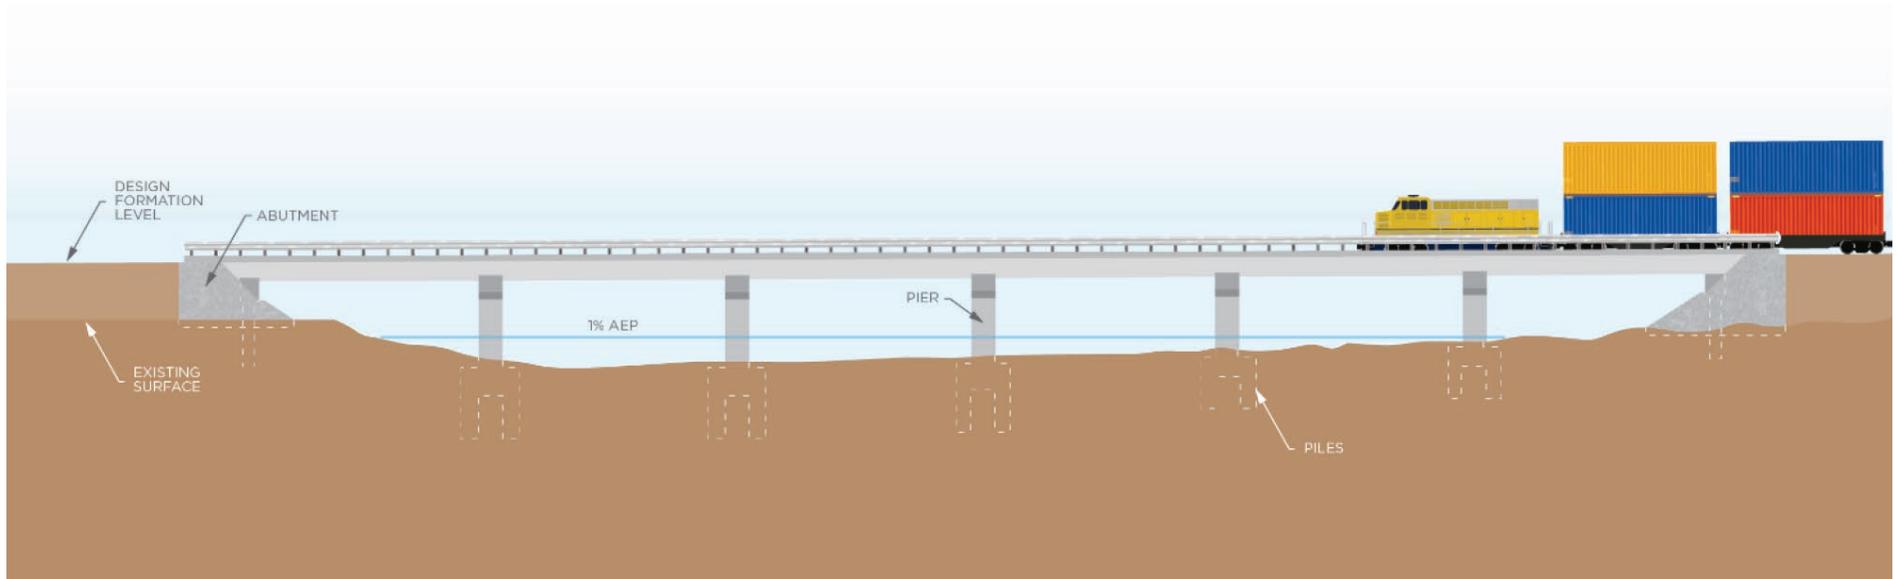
TYPICAL SECTION OF RAIL OVER WATERCOURSE BRIDGE STRUCTURE
